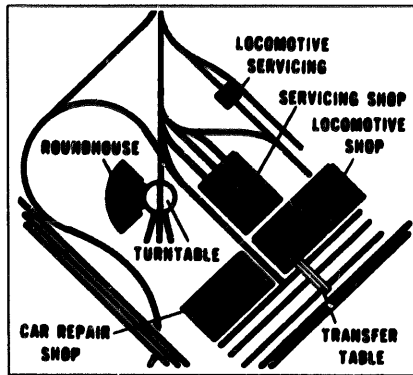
Typical arrangement of facilities at a railroad repair and servicing terminal
